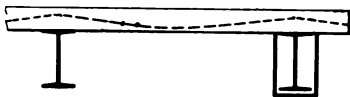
Floor Slab with Curved Expanded Metal Reinforcement.
